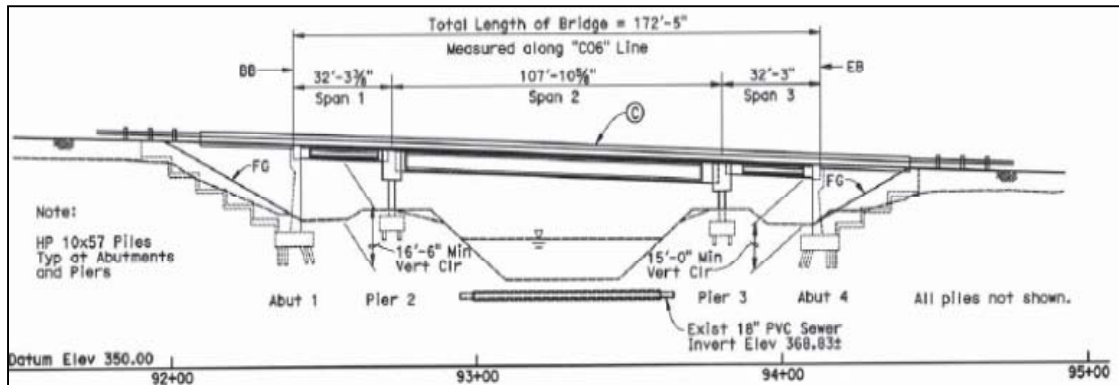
Profile of Proposed Bridge over Friant-Kern Canal
